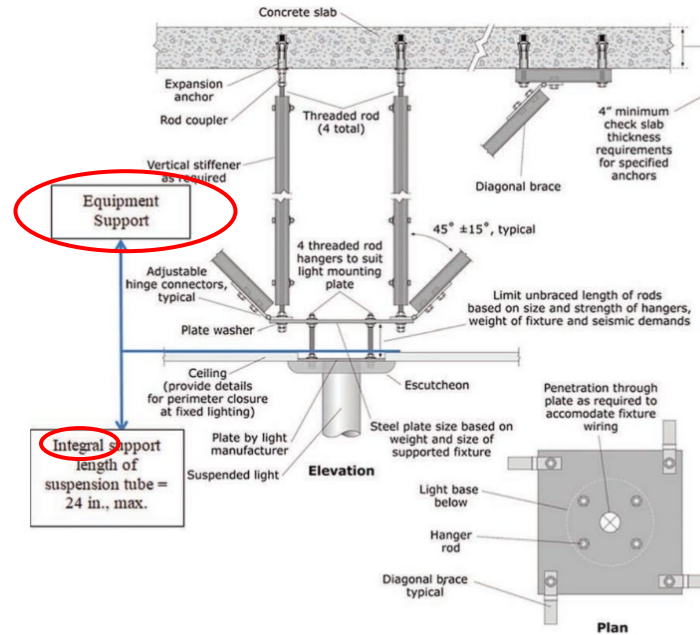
Example of an equipment support structure for a heavy light fixture.
